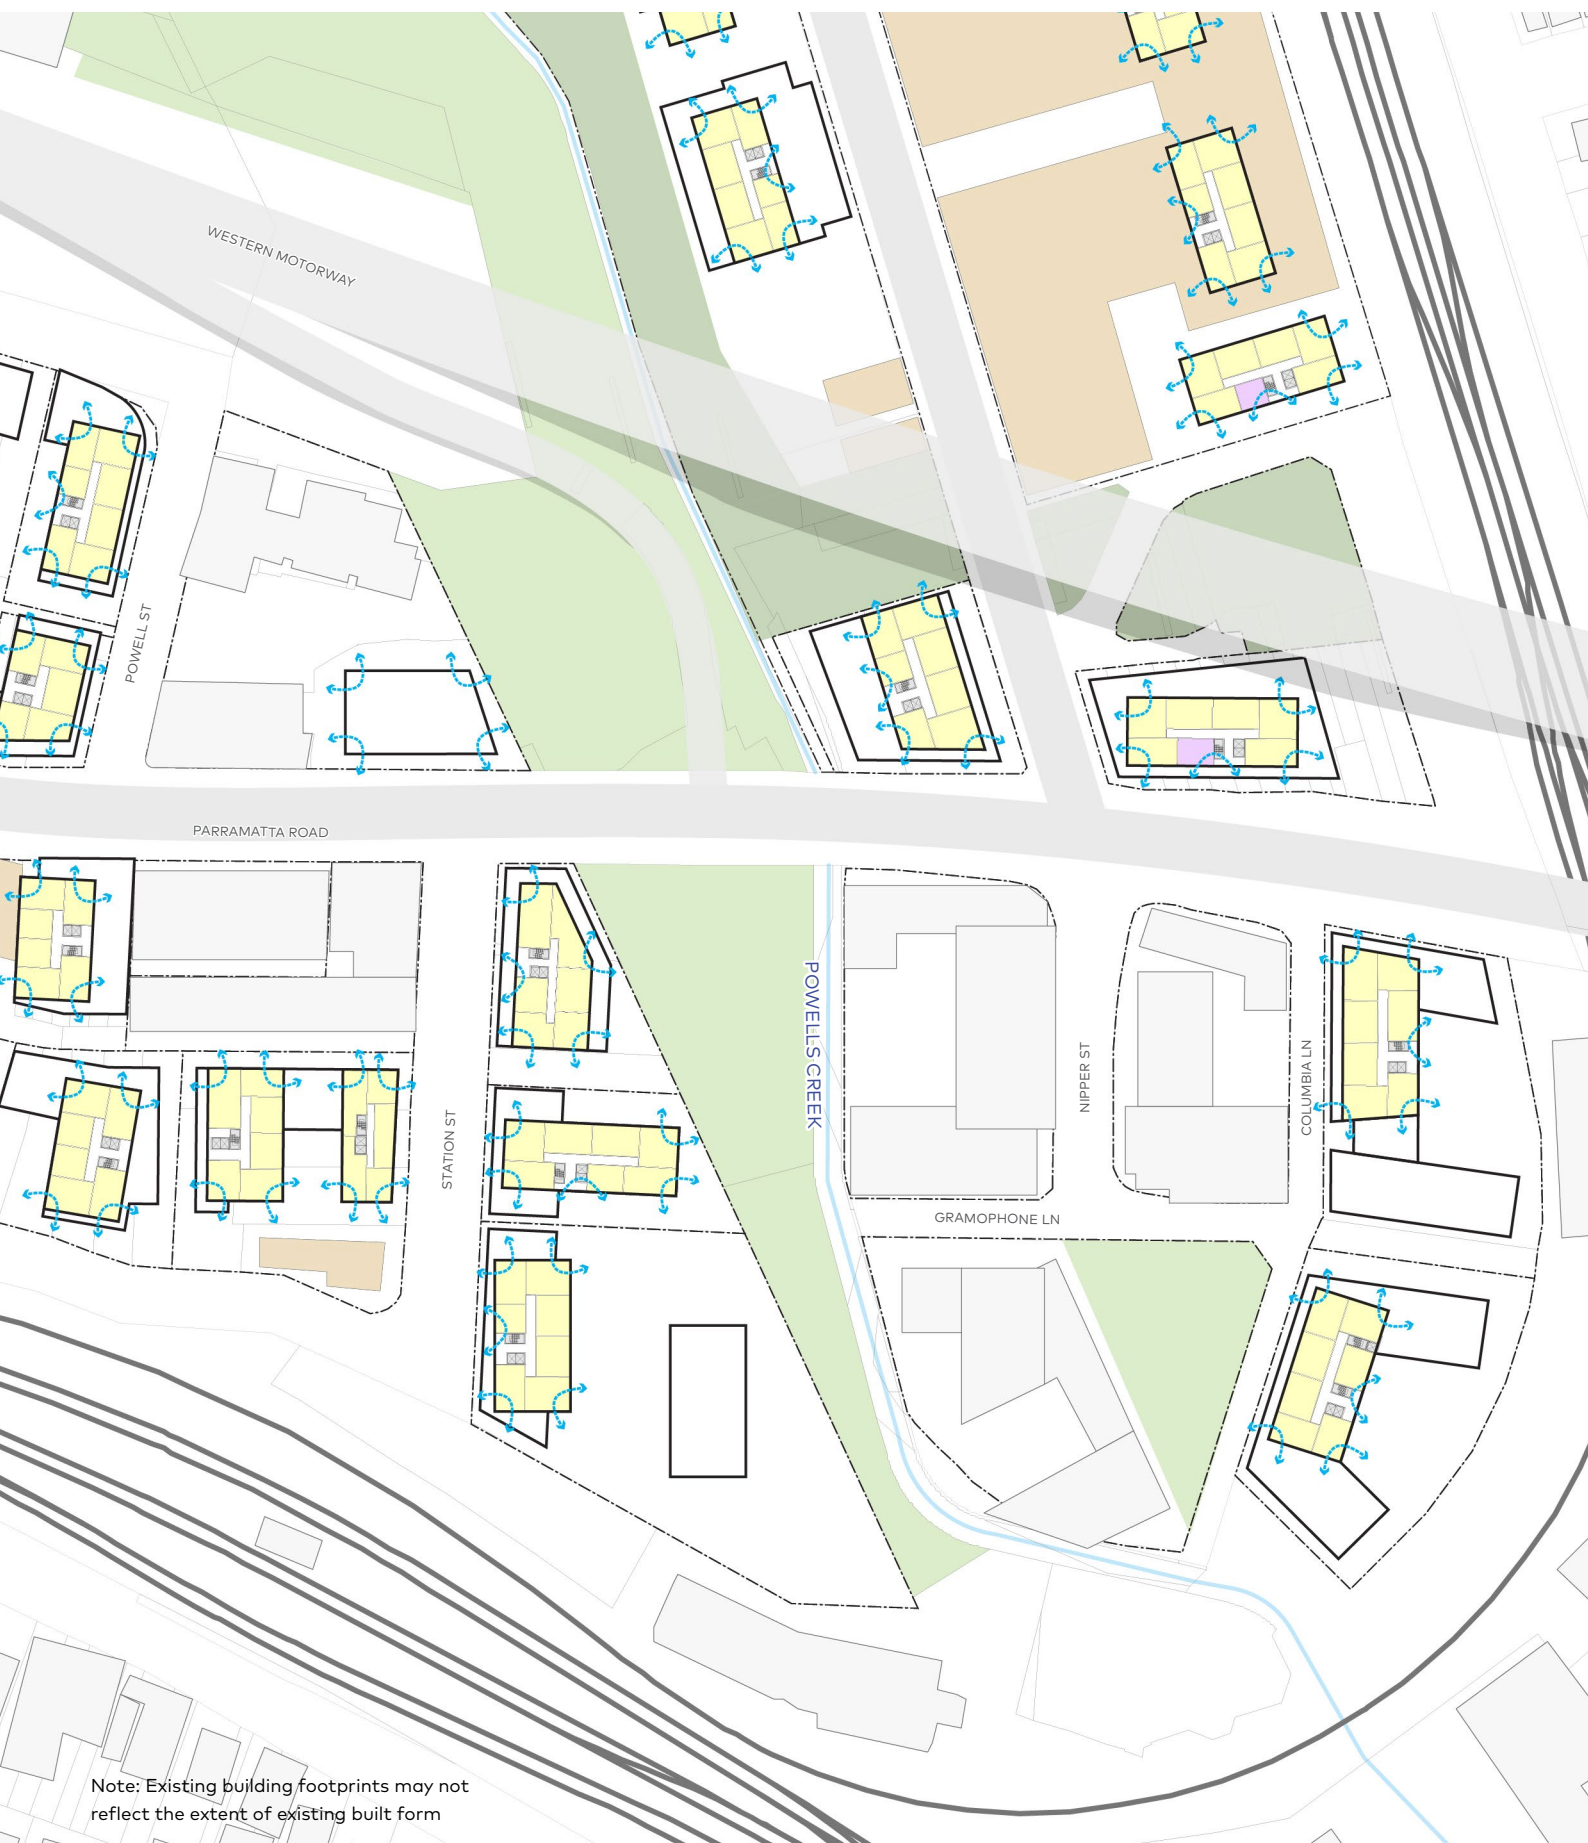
Typical upper level floors - Solar Access & Ventilation - Homebush (South of M4)
